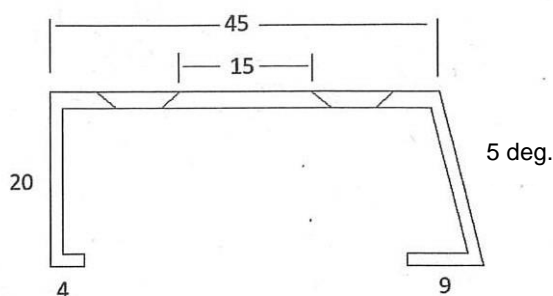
Cross-section of APBNZ aluminium battens used for testing (Note: dimensions in mm, 45 mm wide face 2.25 mm thick and remaining sections 1.5 mm thick)
